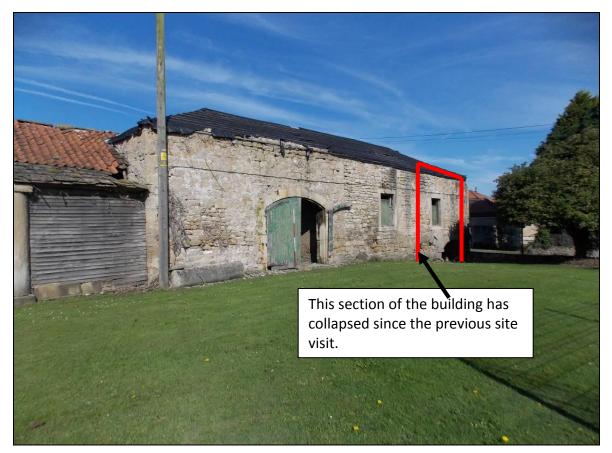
East elevation of Building E, looking north-west in 2012, 2m scale.
